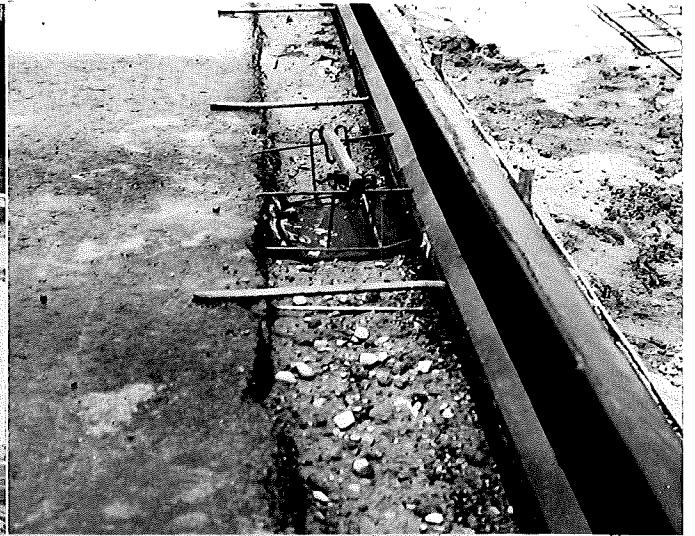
LOOKING NORTH FROM STATION 250 SHOWING 3/4" BITUMINOUS CONCRETE BREAKER STRIP IN PLACE. JUNE 13, 1952.
